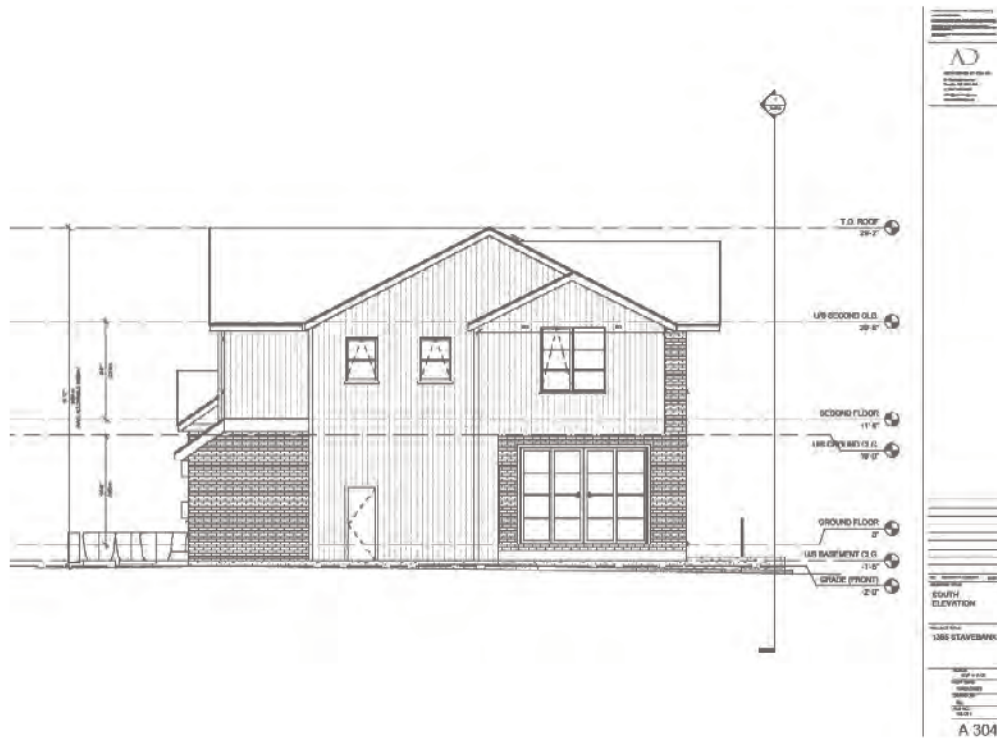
Proposed South Elevation (AEON Design Studio, Inc., 2019)
